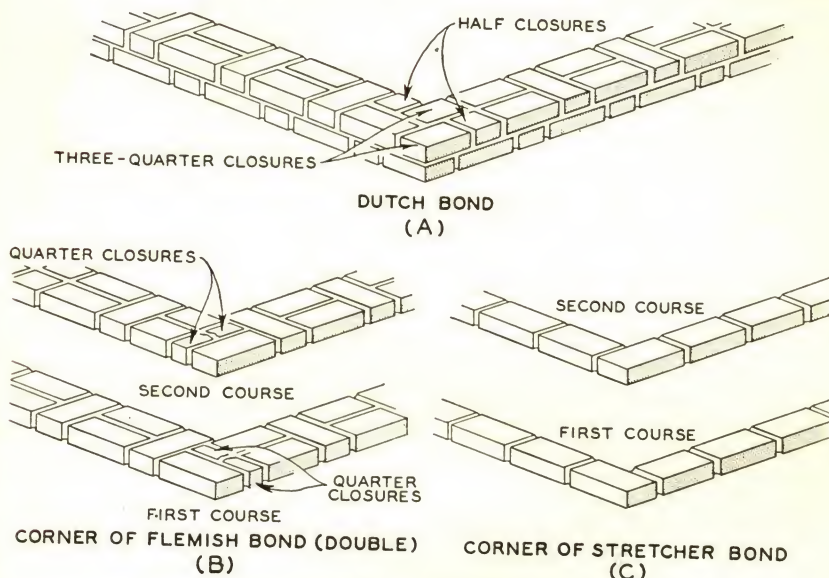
Bond Details for Dutch, Stretcher, and Flemish Bond
